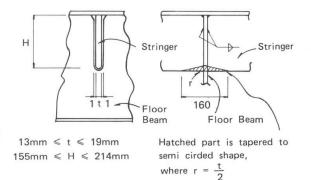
Details of Slit Where Stringer and Floor Beam Meet
